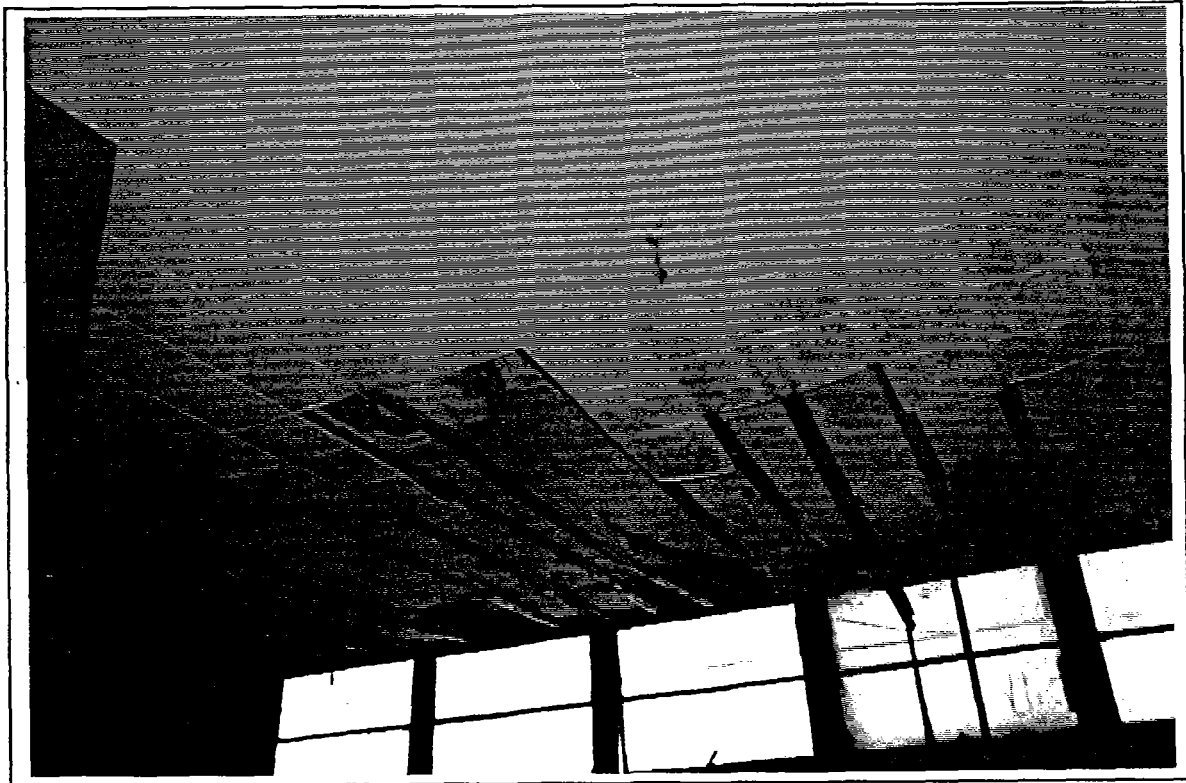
Building 31 - 12 inch x 12 inch tongue-in-groove non-asbestos ceiling tile from room on north side of building. Tile as well as plaster ceiling above and concrete roof panels have all collapsed into building at this location (Sample No. 1-063).
